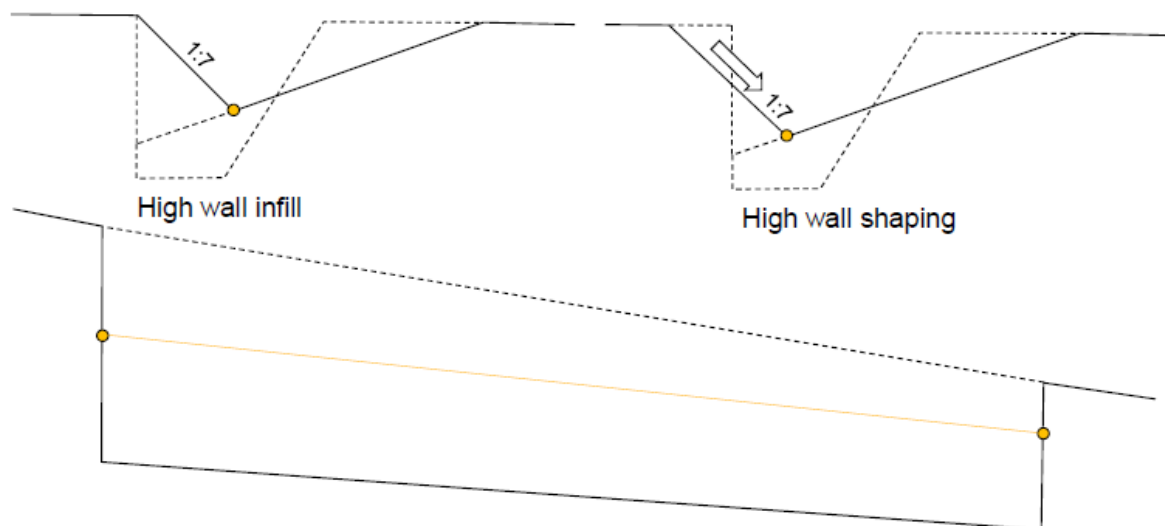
Typical high wall infill/shaping sections (A-A and B-B)
